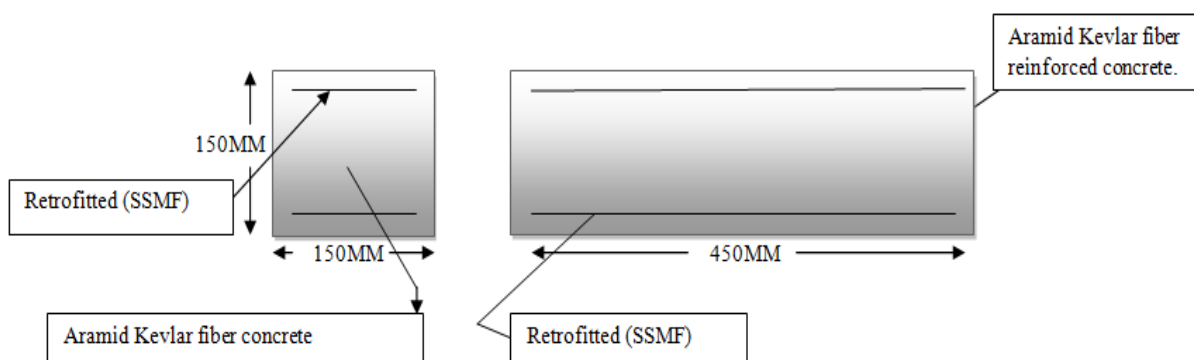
Retrofitting And Reinforced Detailing Of The Beam.
